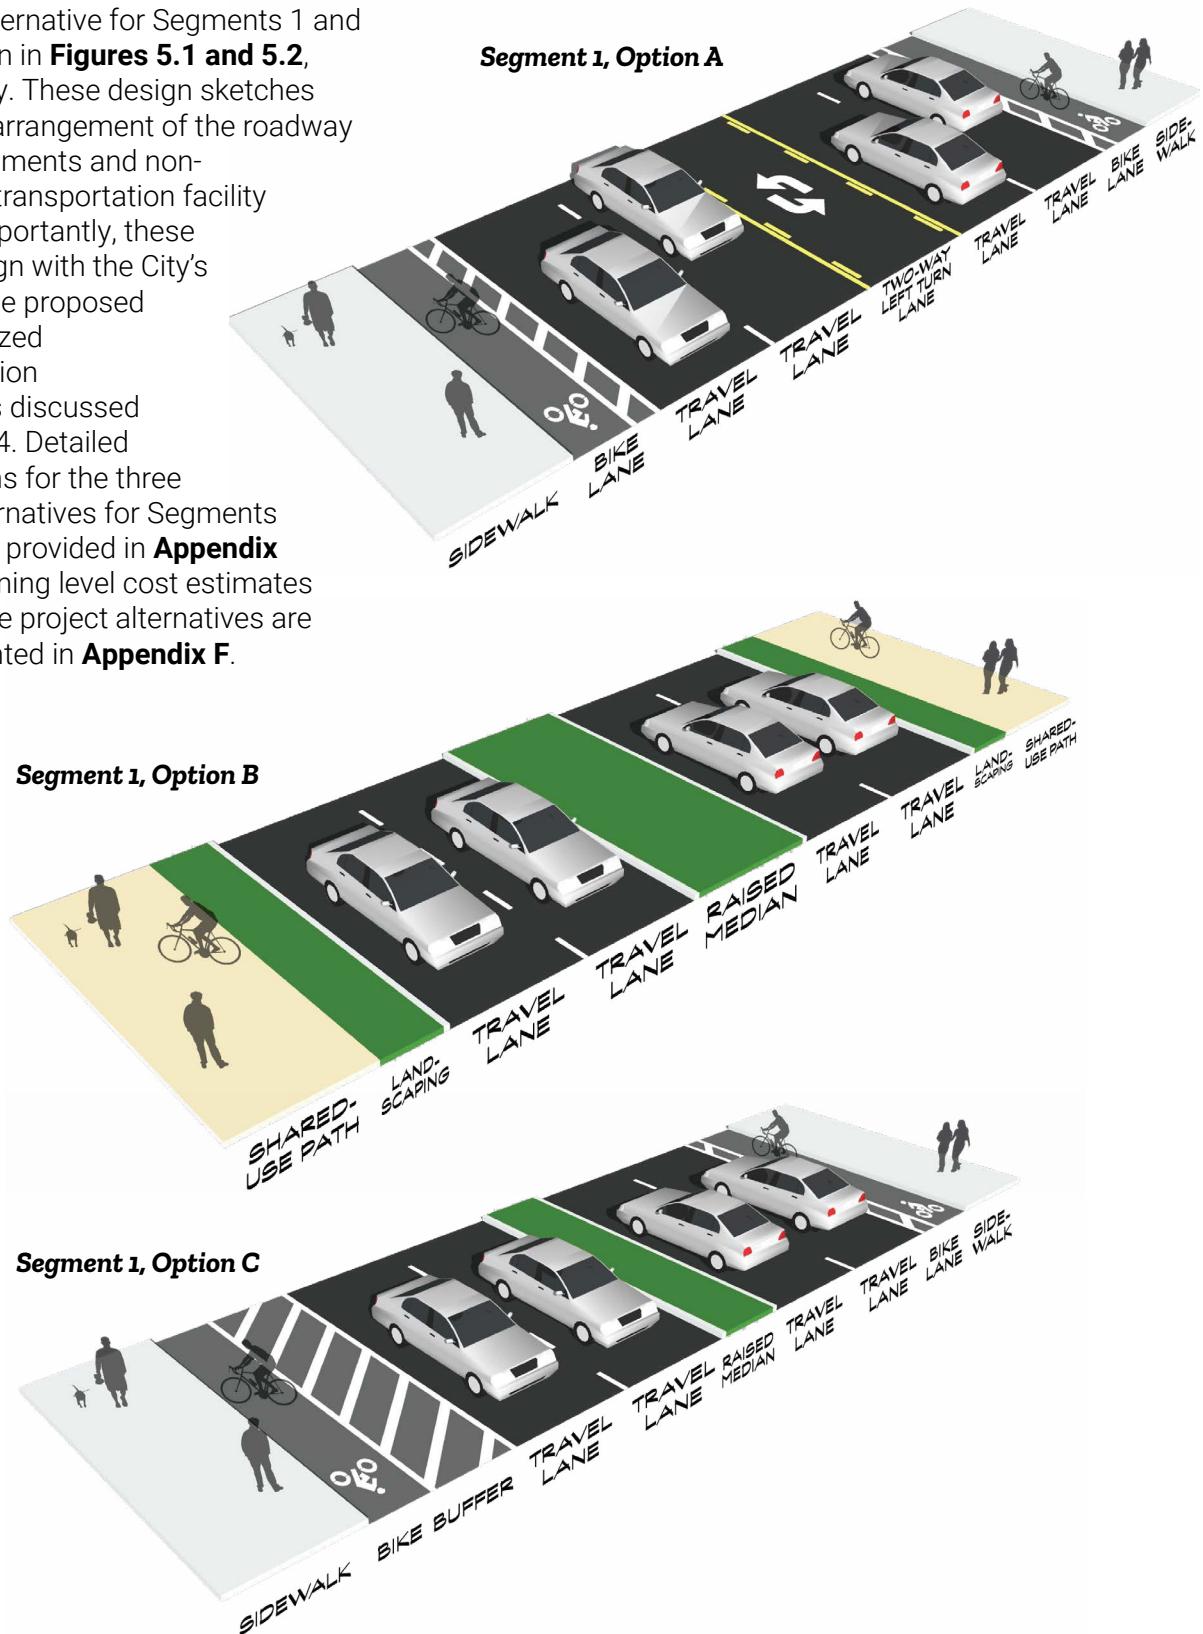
Meridian Design Alternative Cross-Sections – Segment 1
